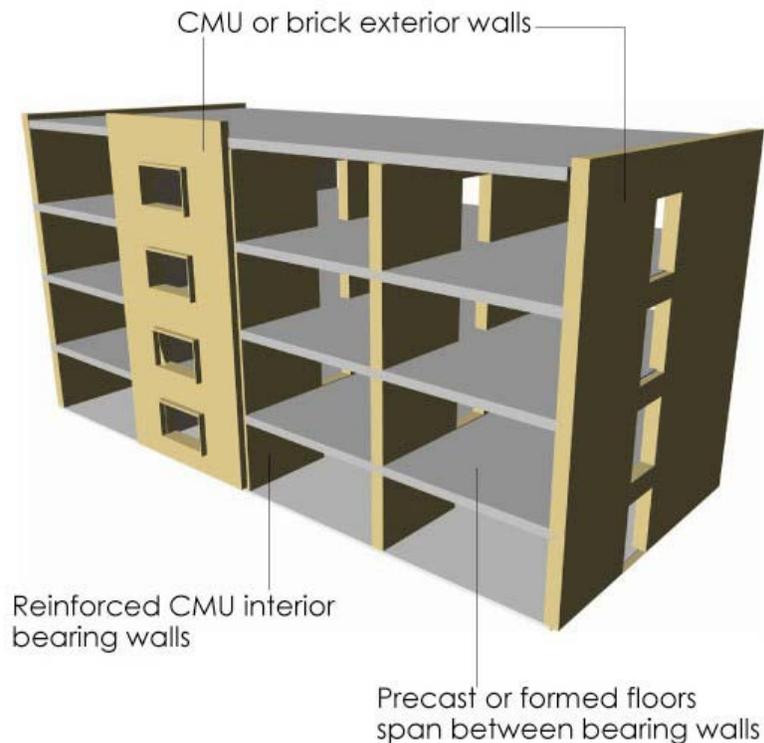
RM2 Building Type: Reinforced Masonry Bearing Walls
